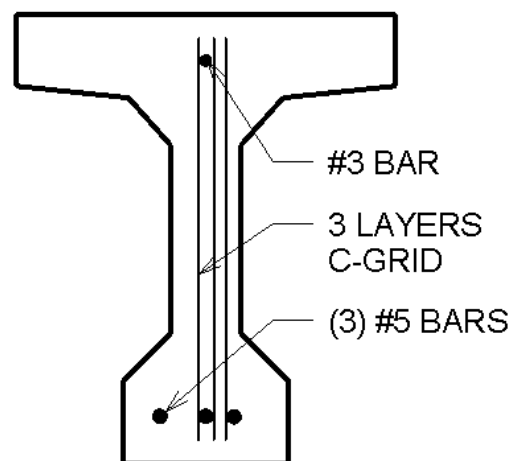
Cross-Section of Specimen 2 Typical C-Grid Reinforcement
